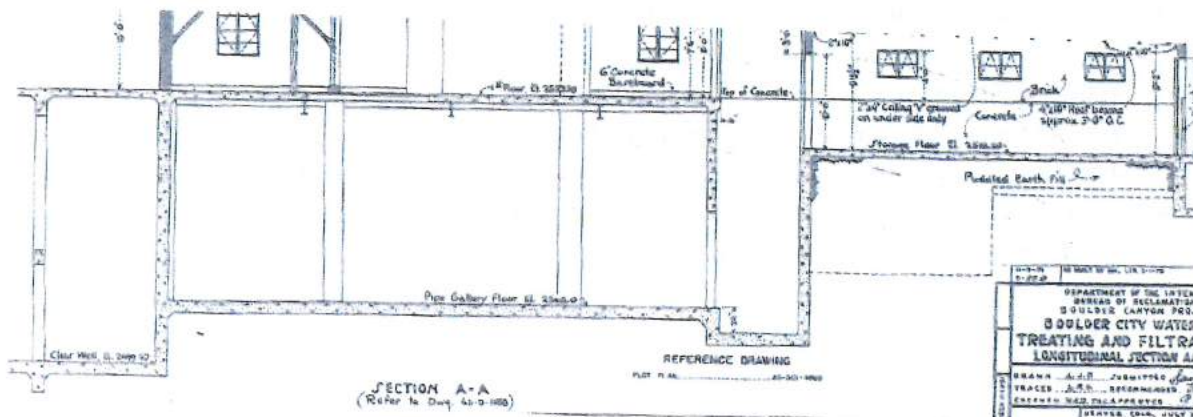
Section Showing Foundations Through Clear Well (left), Pipe Gallery (center) and Unloading Shed (right)
